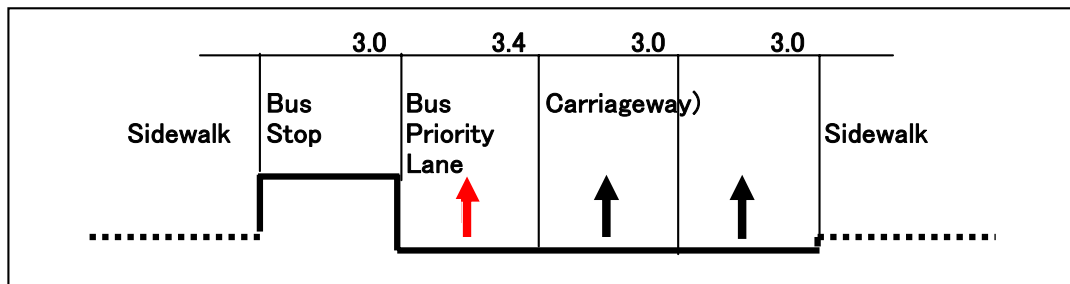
Typical Cross Section of Trunk Bus Priority Lane (Bus Stop Section)
